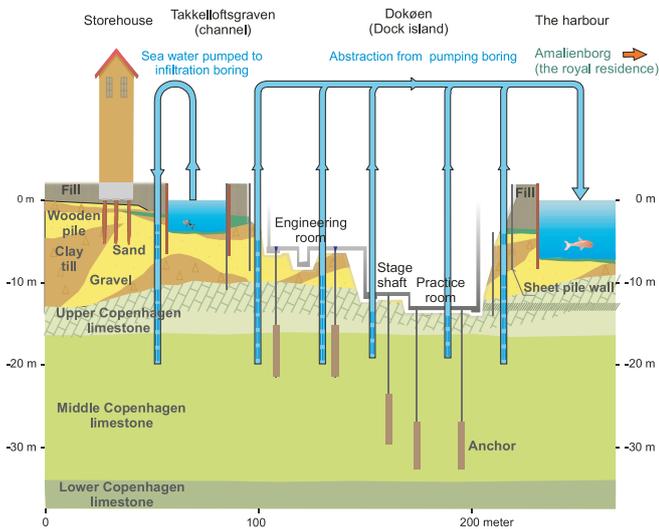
Principal vertical section of the excavation and the groundwater lowering system.
